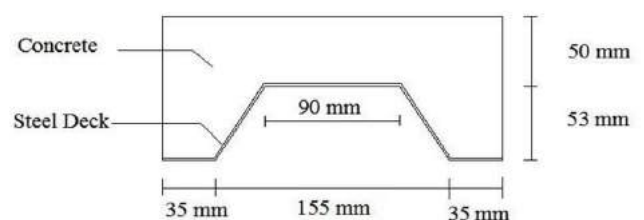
Dimensions of Slab Section of Simply Supported Slab
